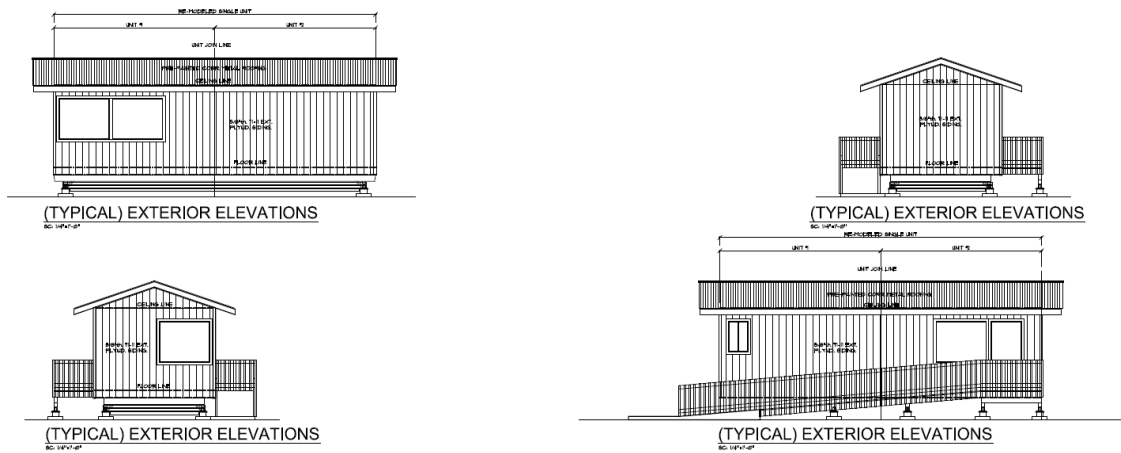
Typical Single Unit Exterior Elevations²¹⁰
